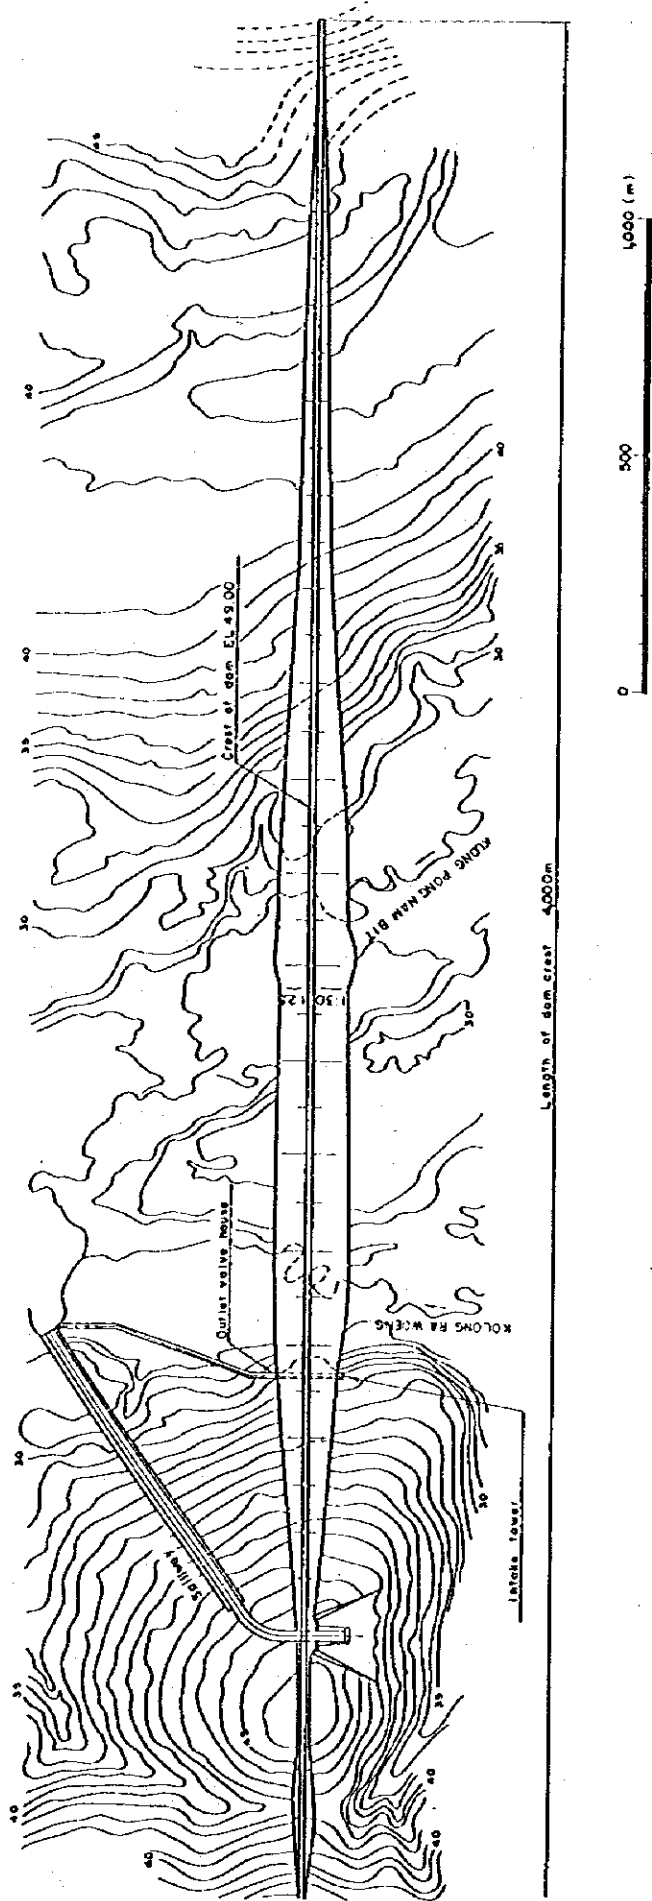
Longitudinal Profile of Nong Pla Lai Dam
